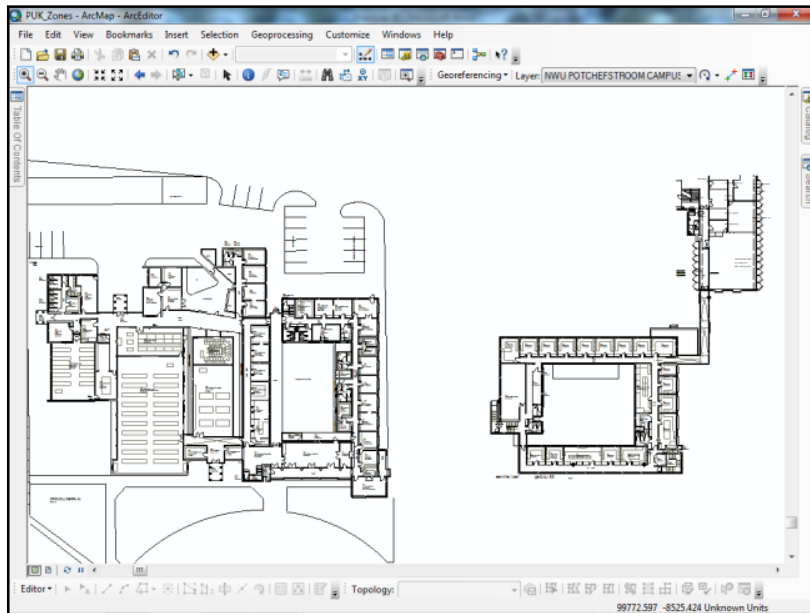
Layout of building E4 (Department of Technical Services, 2011)
